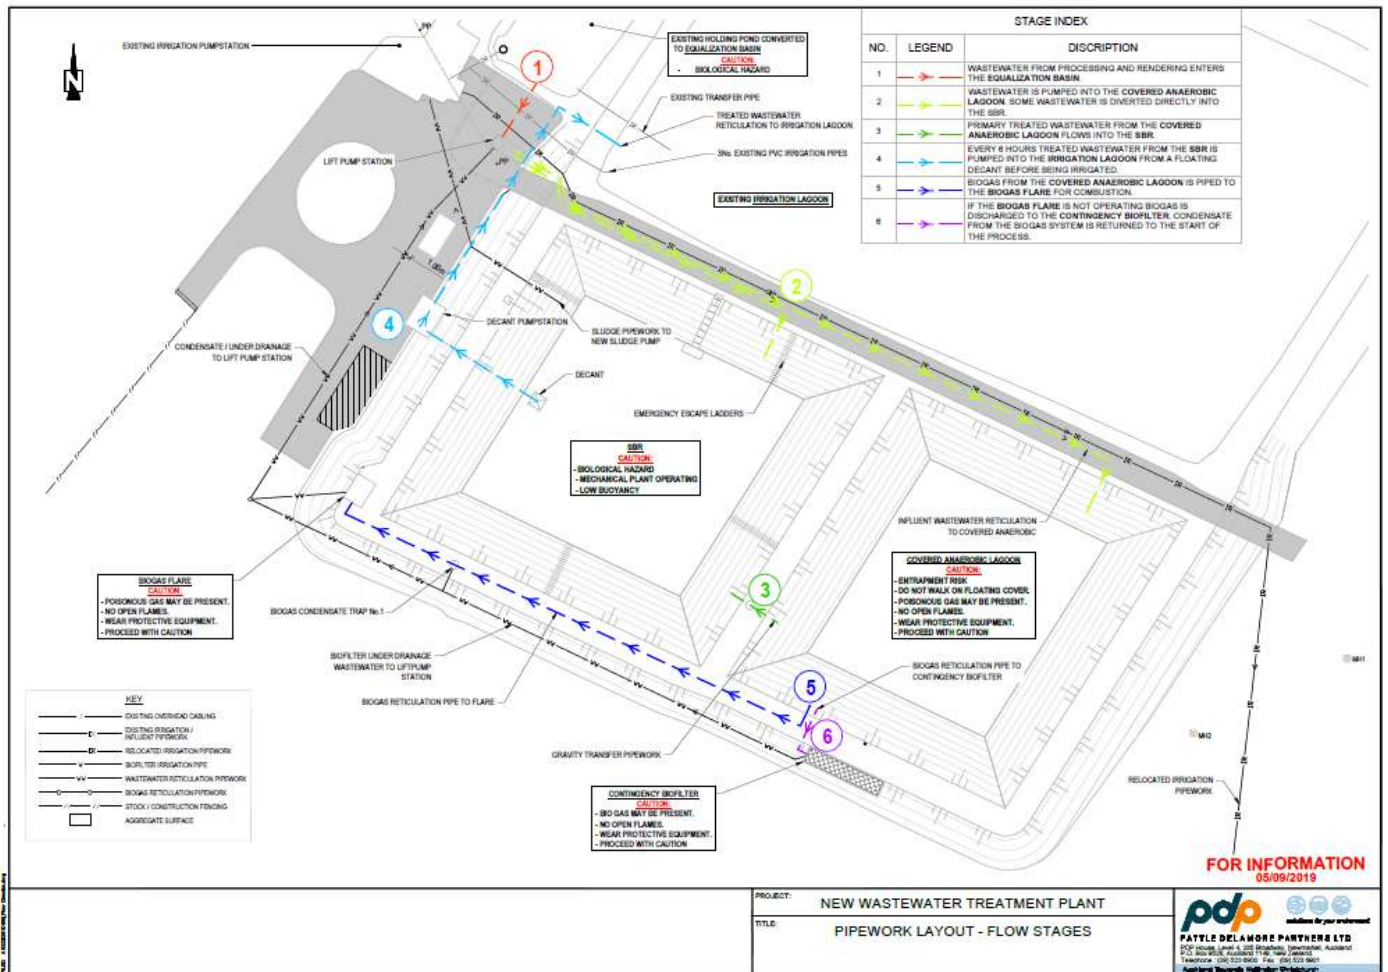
Wastewater treatment plant general layout (Source: PDP Ltd)
